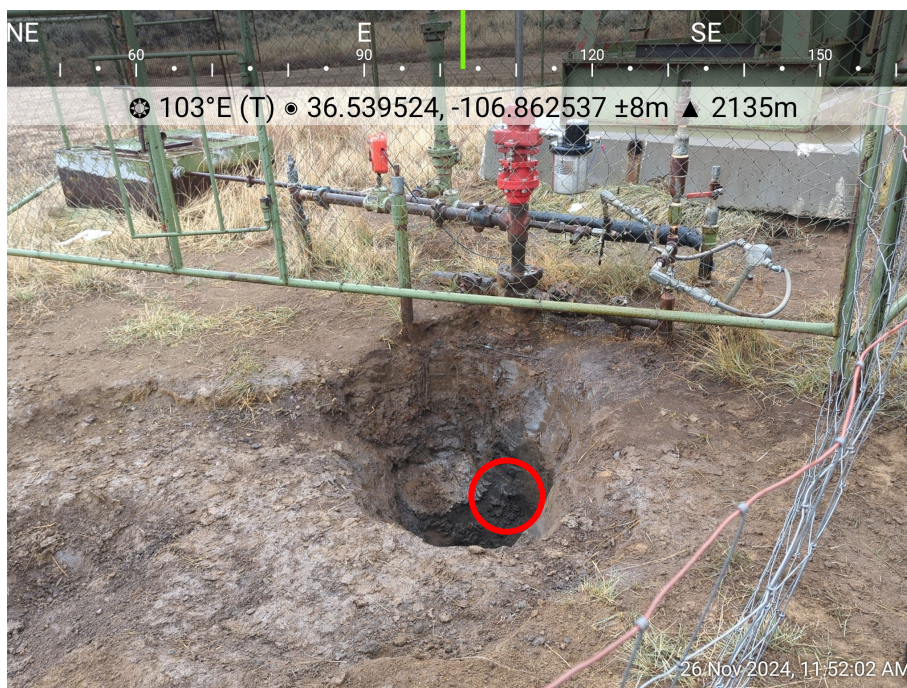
SS02 collected as a discrete sample from within the wellhead excavation.
